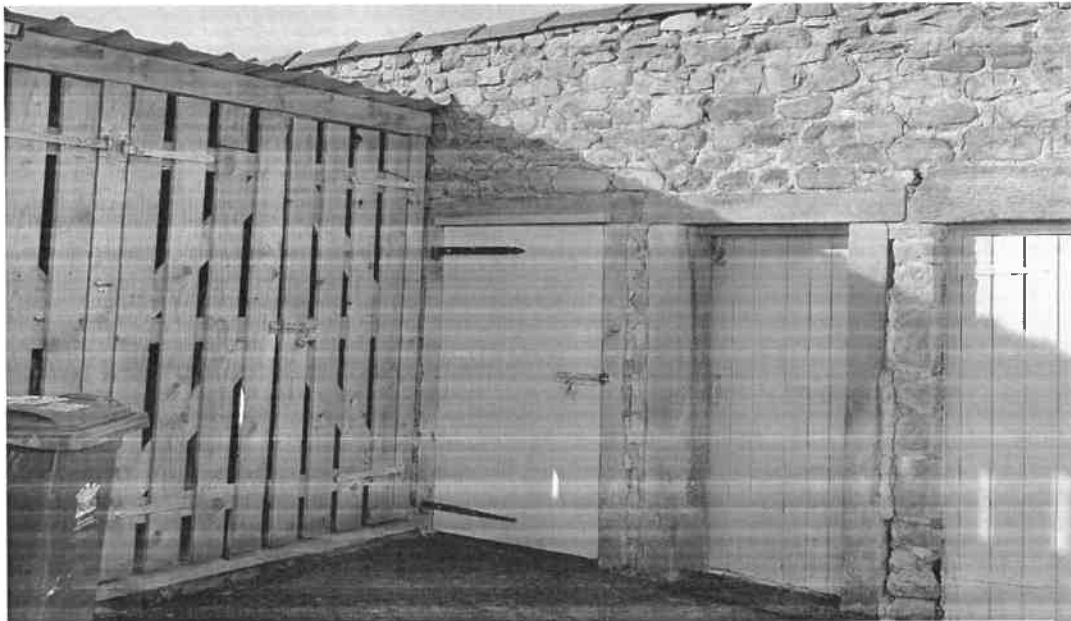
Example of cracks and gaps in the stonework of rooms B, C, and D.
